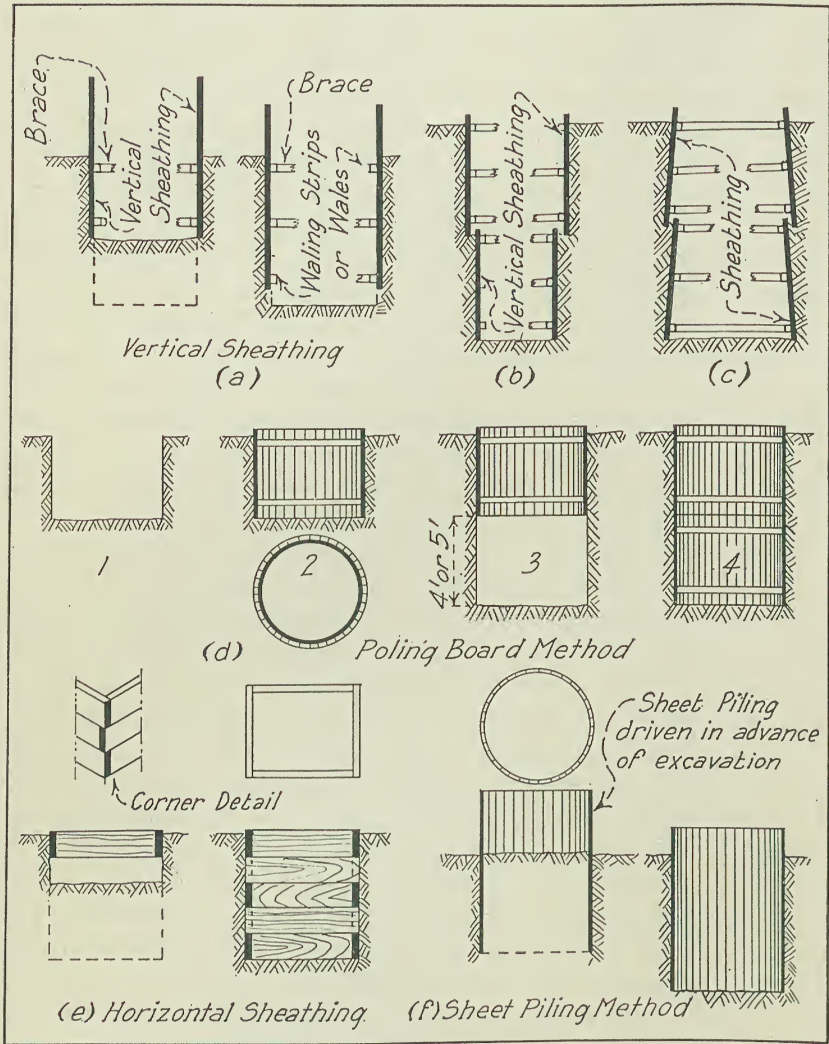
Horizontal and Vertical Sheathing for Open Wells
